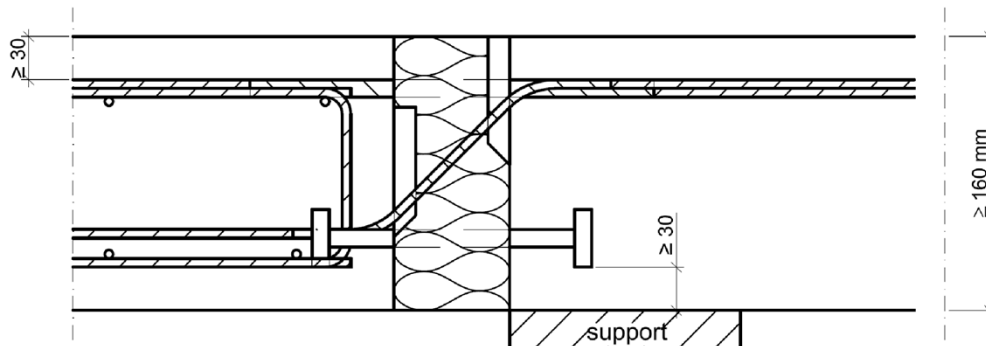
Example of Schöck Isokorb® Type K with SCE with vertical reinforcement according to section D.1.1
